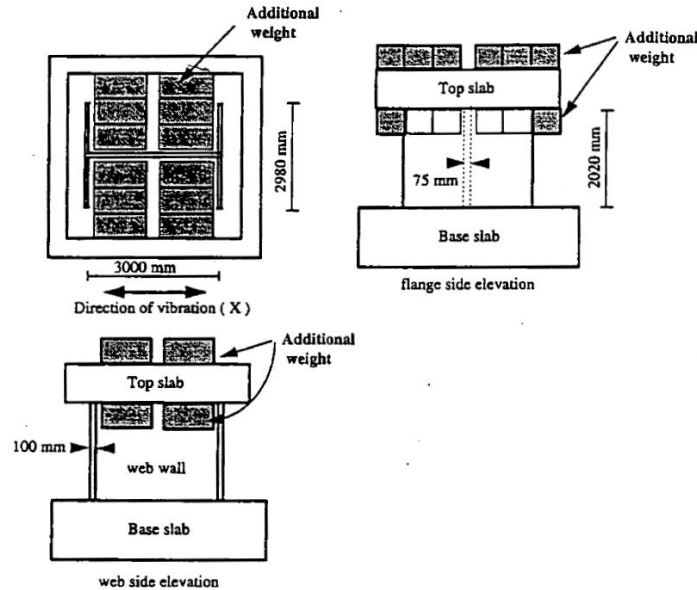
Reinforce Concrete Shear Wall Structure. Ile, N., and Reynouard, J. (2000), “Nonlinear Analysis of Reinforced Concrete Shear Wall under Earthquake Loading.” *Journal of Earthquake Engineering* 4 (2): 183–213. Used under fair use, 2014.
